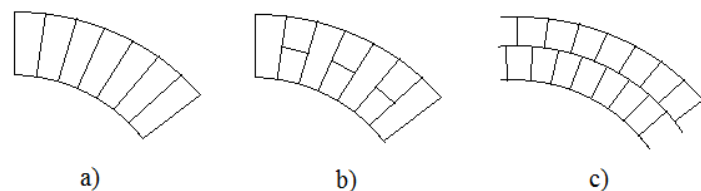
a) Single-ring voussoir arch. b) Header-bonded construction. c) Multi-ring arch
